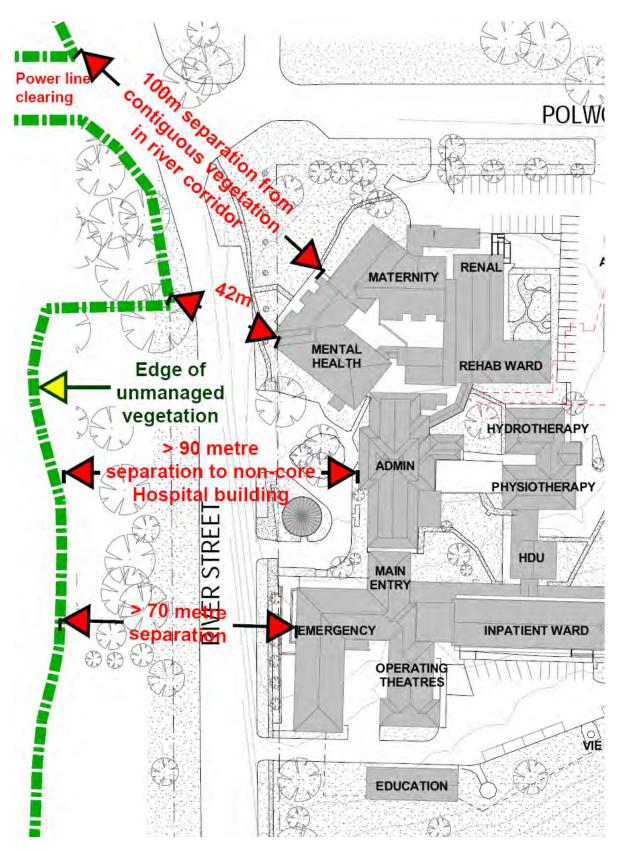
Plan showing the Asset Protection Zone widths to the new Building.
